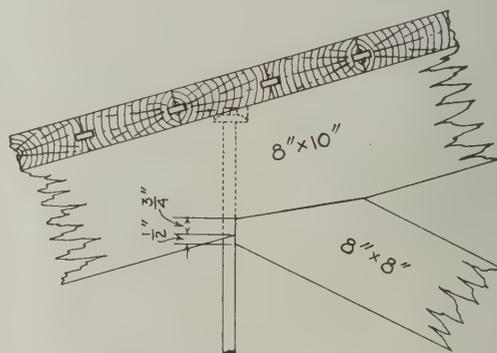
Proper Method of Making Joint Between Brace and Upper Chord of Truss
